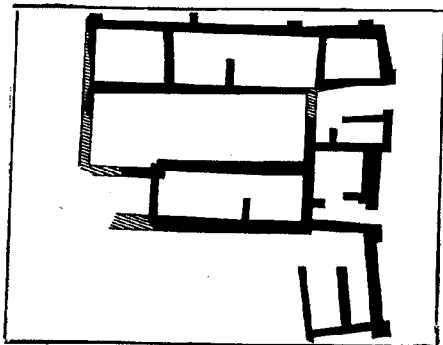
Plan of House in level XVIII at Tepe Gawra (after Tobler 1950, pl. XIX).
